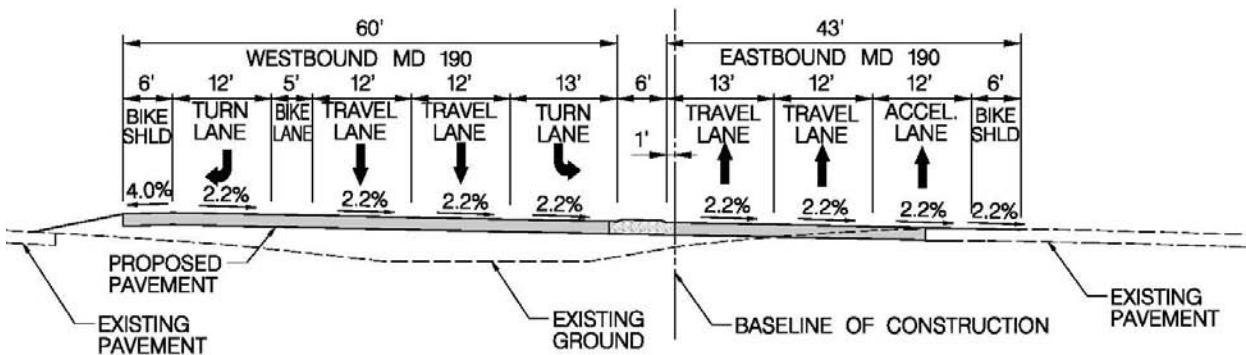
Alternative 1 - MD 190 Intersection East of Pyle Road
